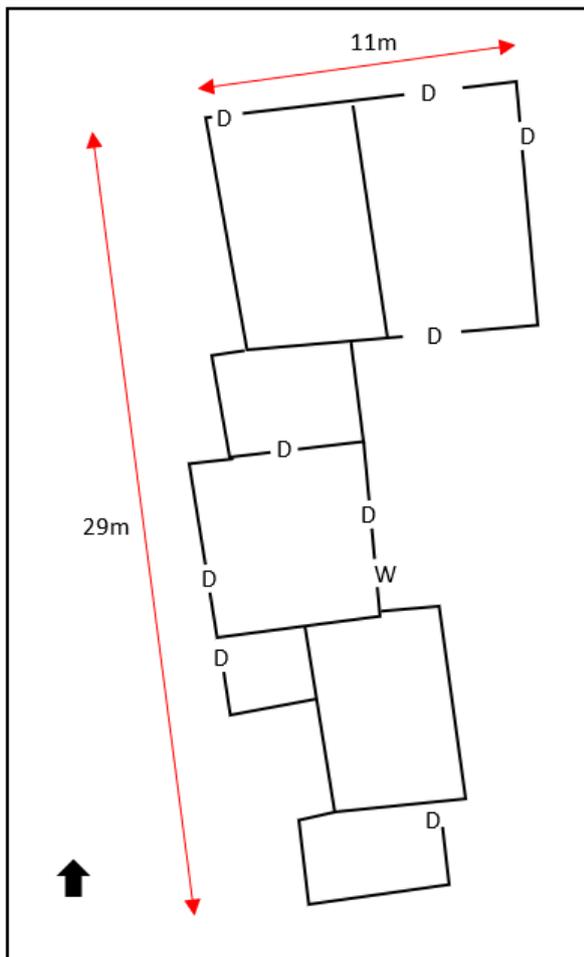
Plan of the house at waypoint 112 in HL02.
